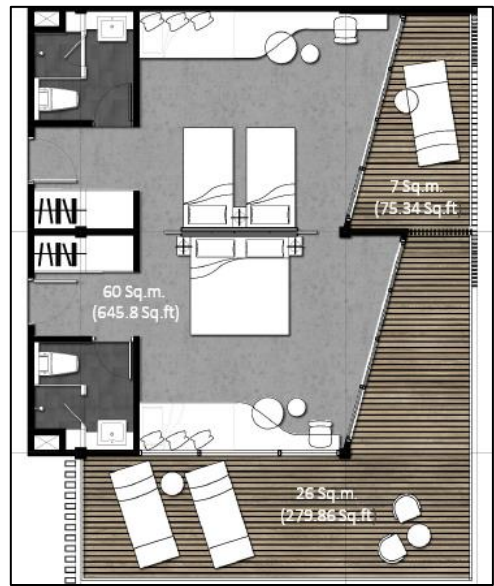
Layout Plan of New Three-Storey Building's Second Floor
